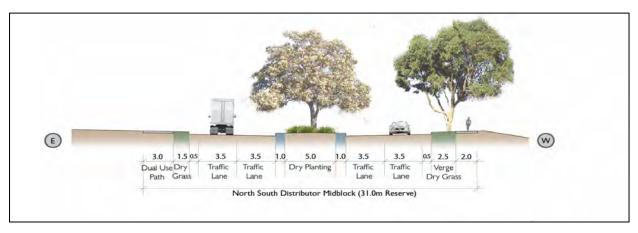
Proposed Road Reservation Width and Cross-Section for the NSDDR - North of Hope Valley Road
